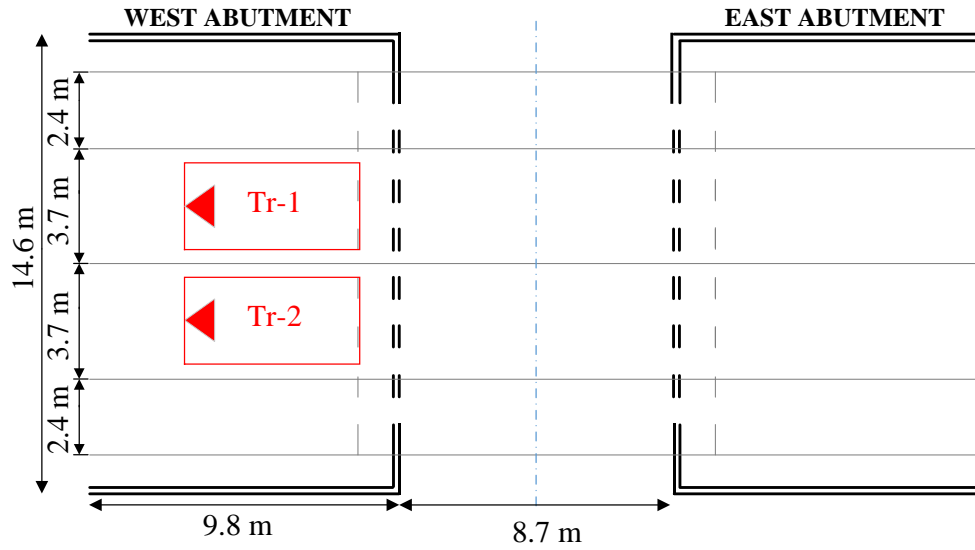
Live load test, truck position number 3 (P3) – trucks facing west.
